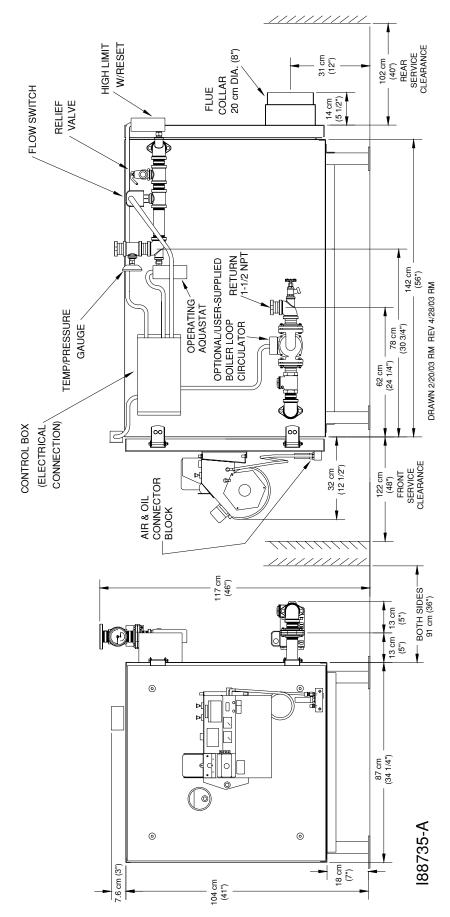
Model CB-350-CTB Dimensions (Single Boiler)
